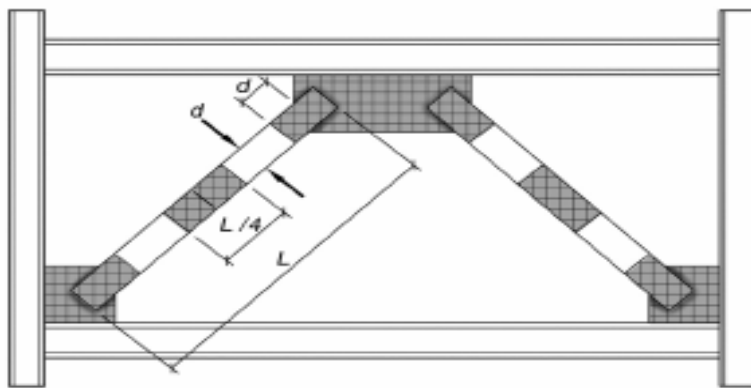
Protected zone of inverted-V braced frame.
